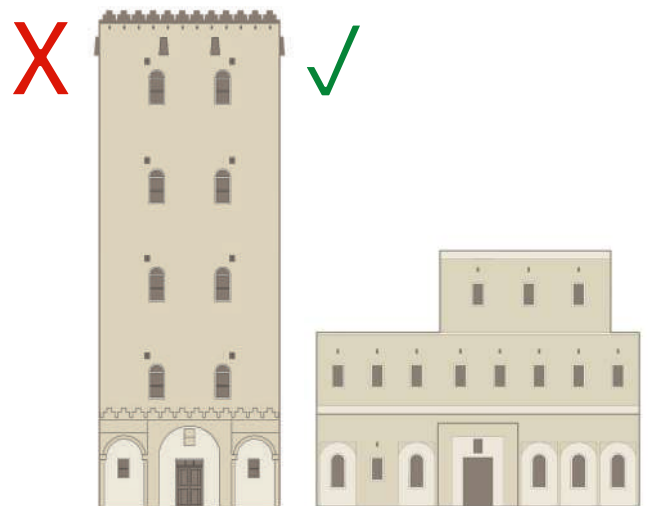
Break down building massing to better fit traditional architectural elements\
